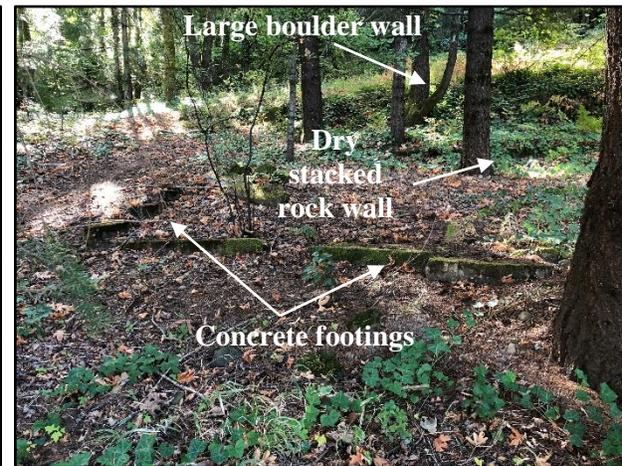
Concrete footings on the terrace above the HCRH-bordered retaining wall (view south).
